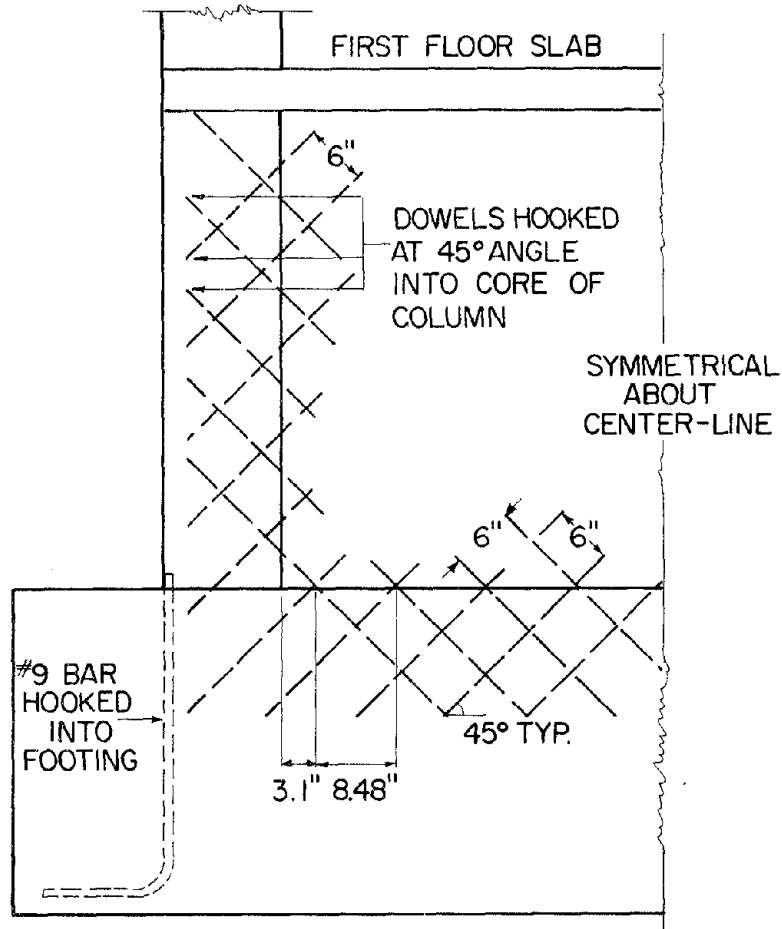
VIEW SHOWING PLACEMENT OF REPAIR STEEL AT FIRST-STORY LEVEL--SPECIMEN SW8 VIRGIN
